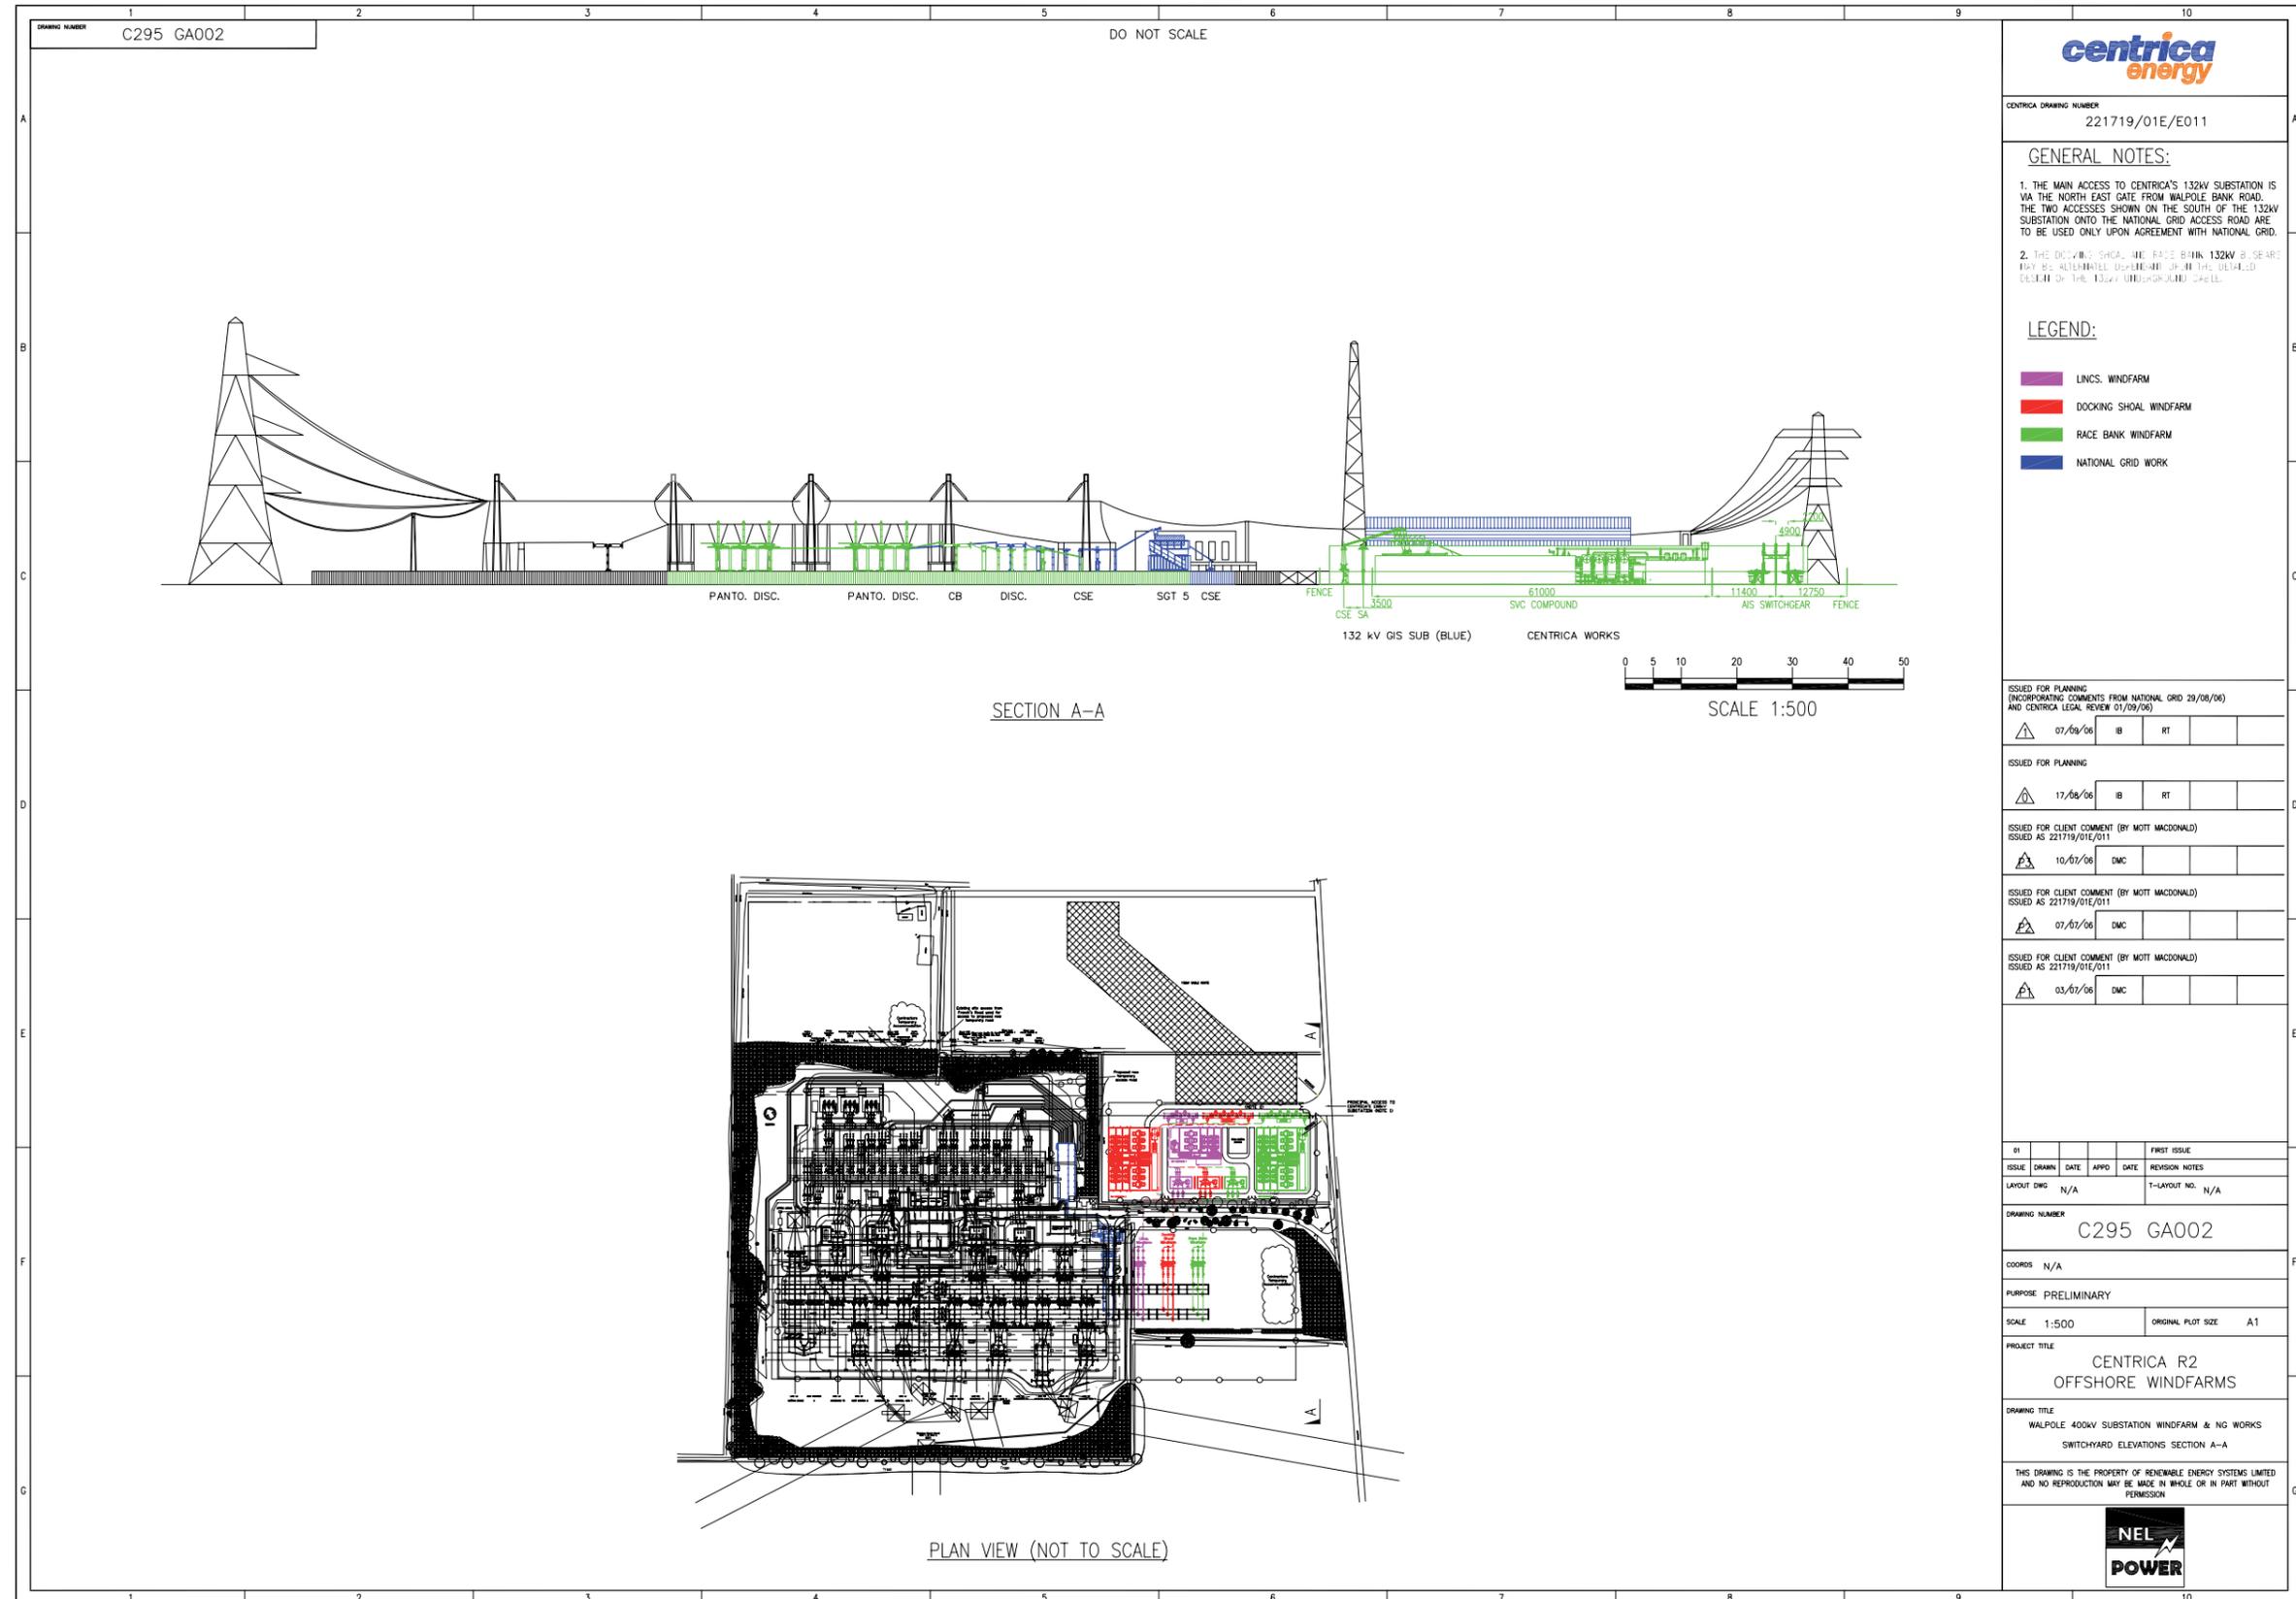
| Layout of the substations for Lincs, Docking Shoal and Race Bank in relation to the existing substation at Walpole Marsh - Section A-A
